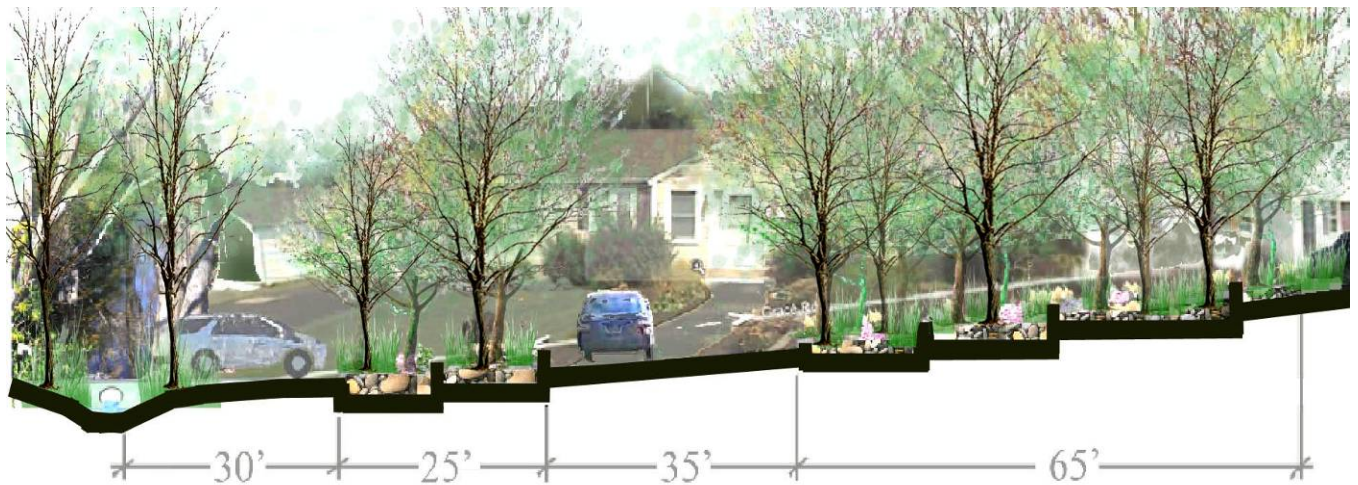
Proposed greenway from Winning & Shannon Farms to Whispering Hill, via Battle Hill conservation area
